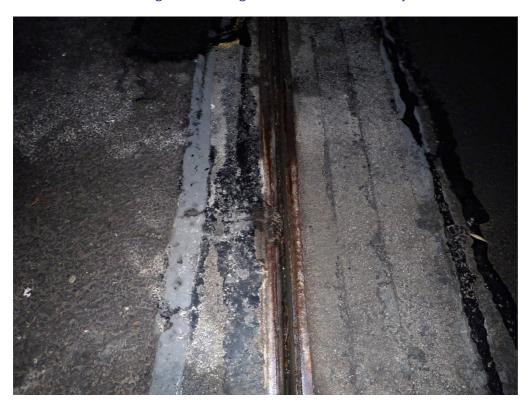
Non-Continuous & untidy Joint in the nosing rails, West Abutment
